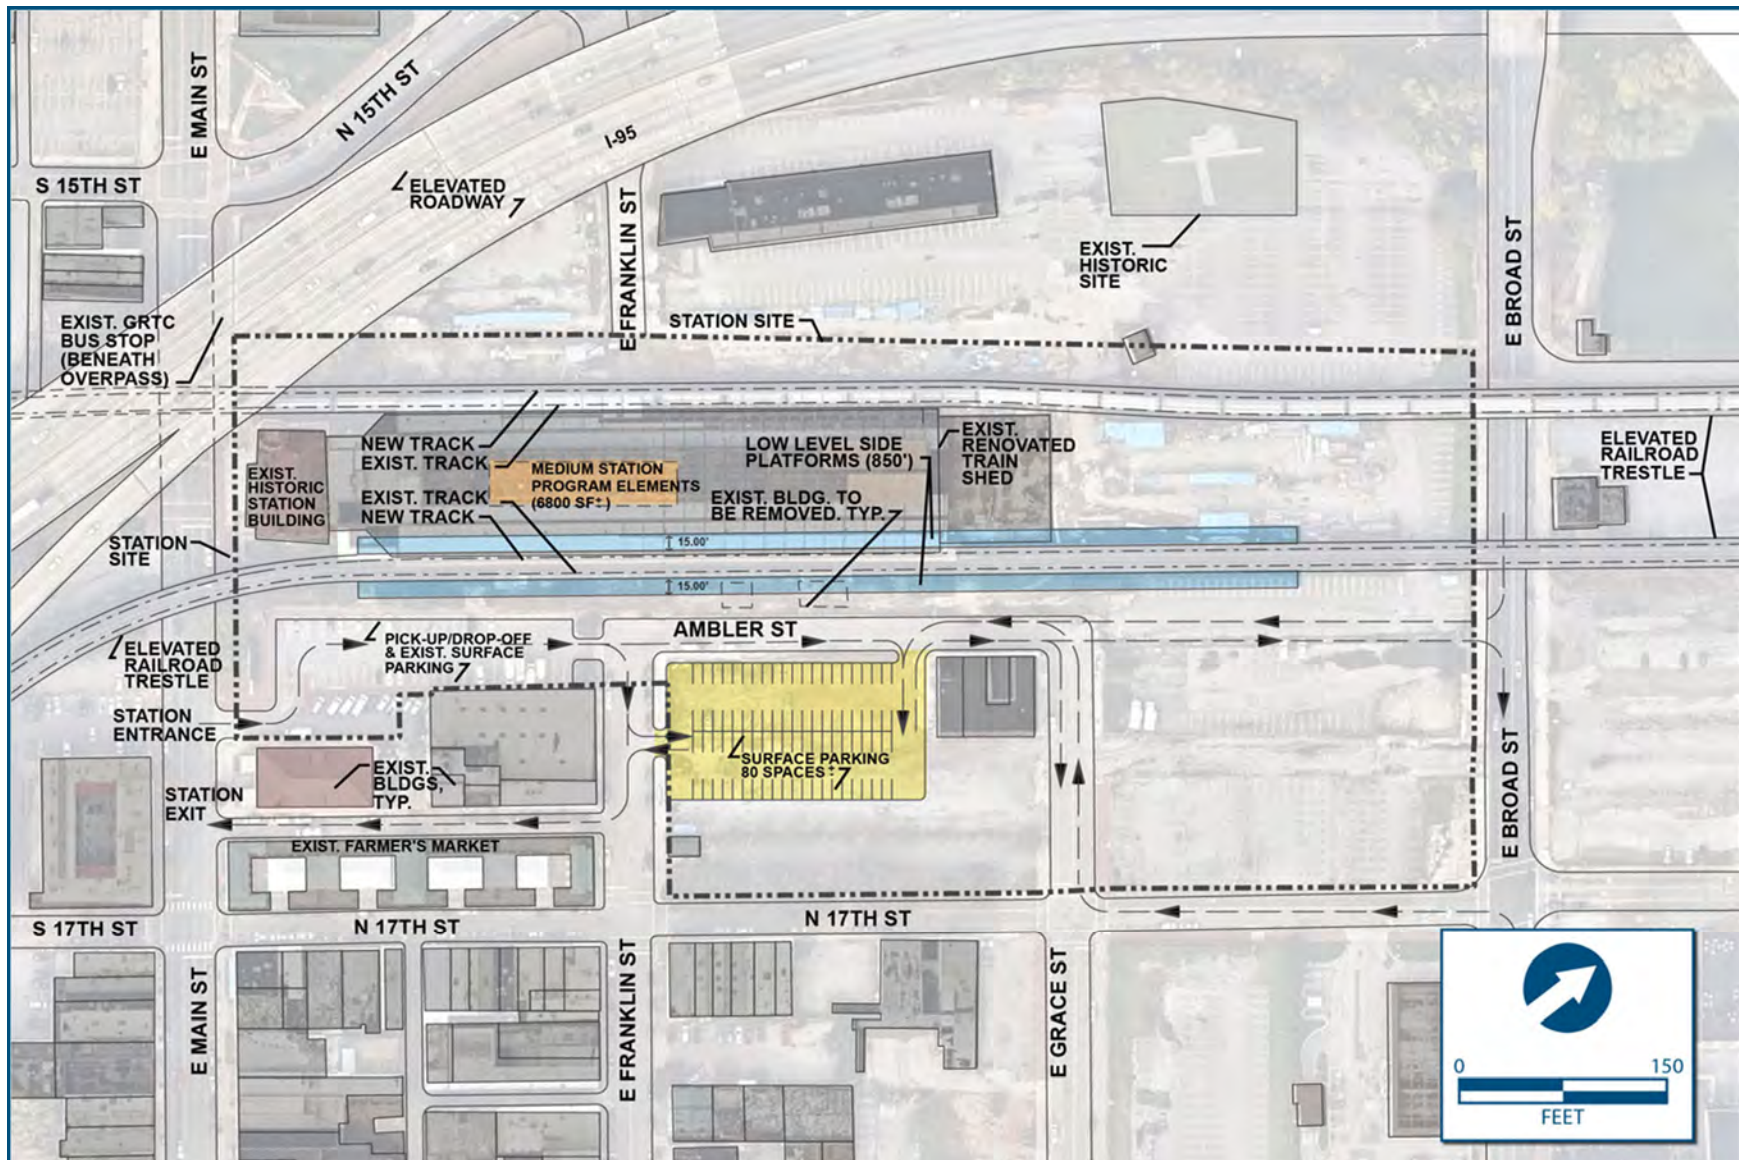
Main Street Station Improvements for Build Alternative 6E
